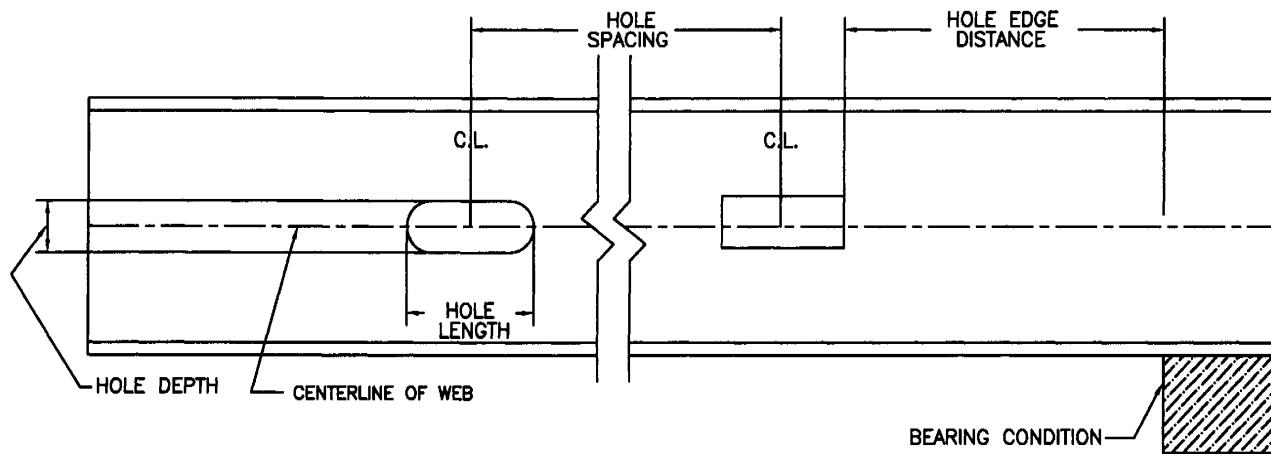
Floor and Ceiling Joist Web Holes
